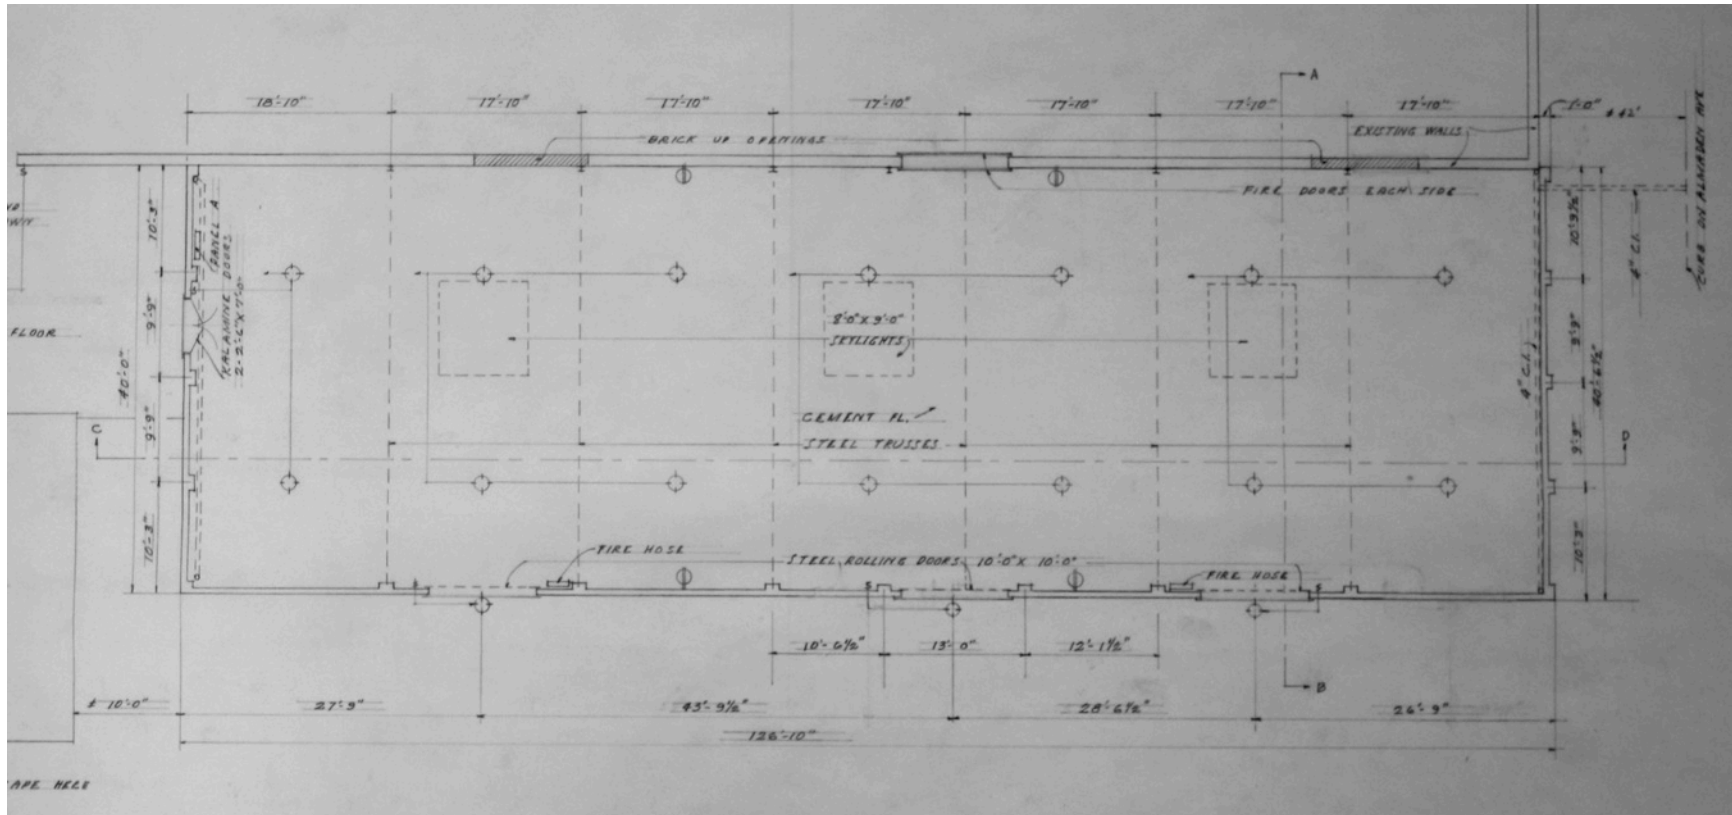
Floor plan for new Farmers' Union warehouse building, Ralph Wyckoff, Architect, October 8, 1945.
